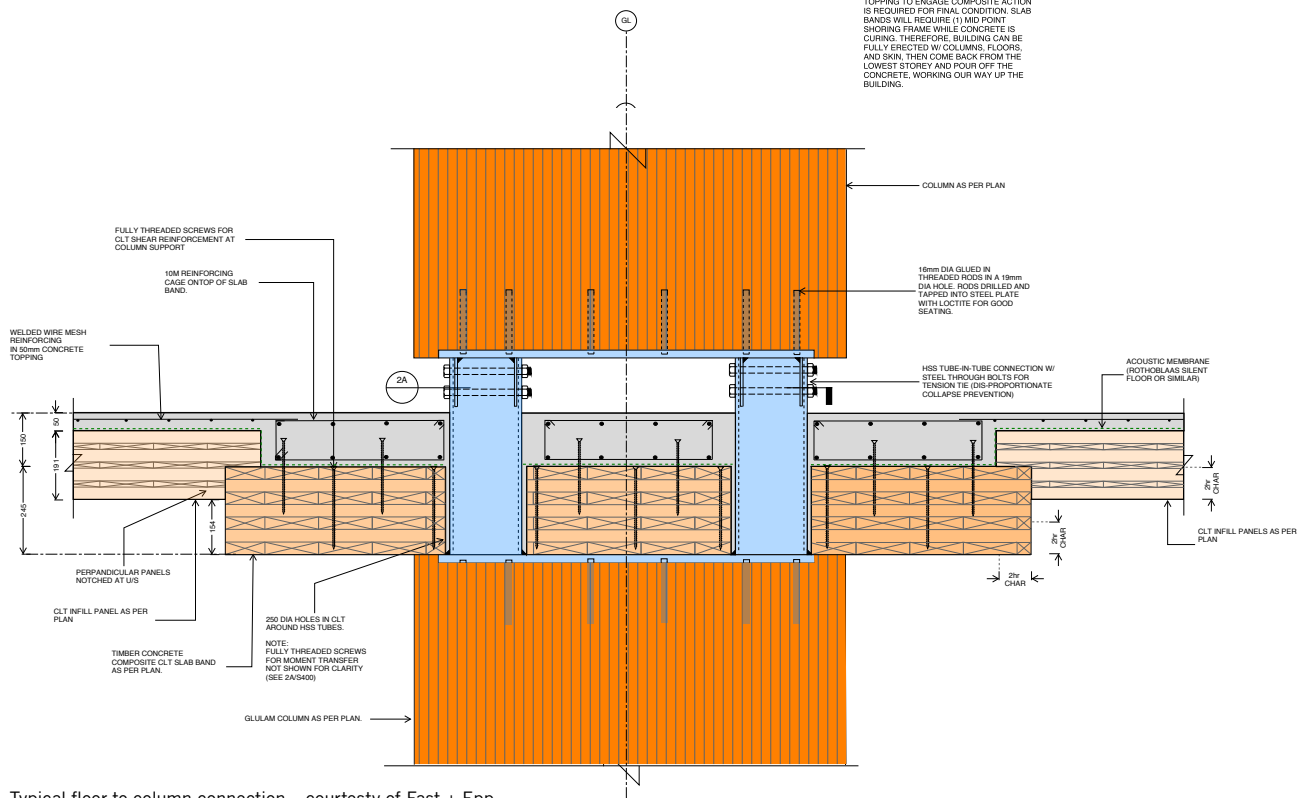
Typical floor to column connection – courtesy of Fast + Epp
